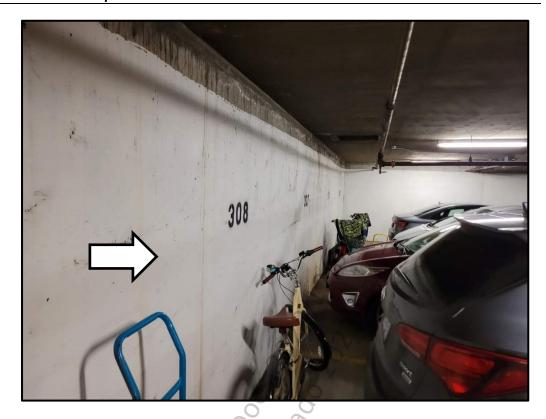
(A10 00 00) - Foundation Wall Viewed From Within Parkade
